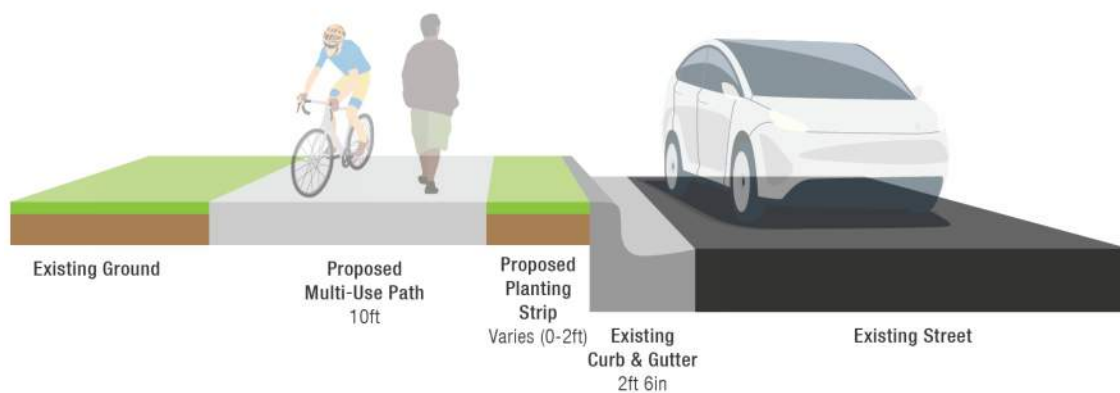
Ridgecrest Trail Connector Concrete Multi-Use Path Typical Section
